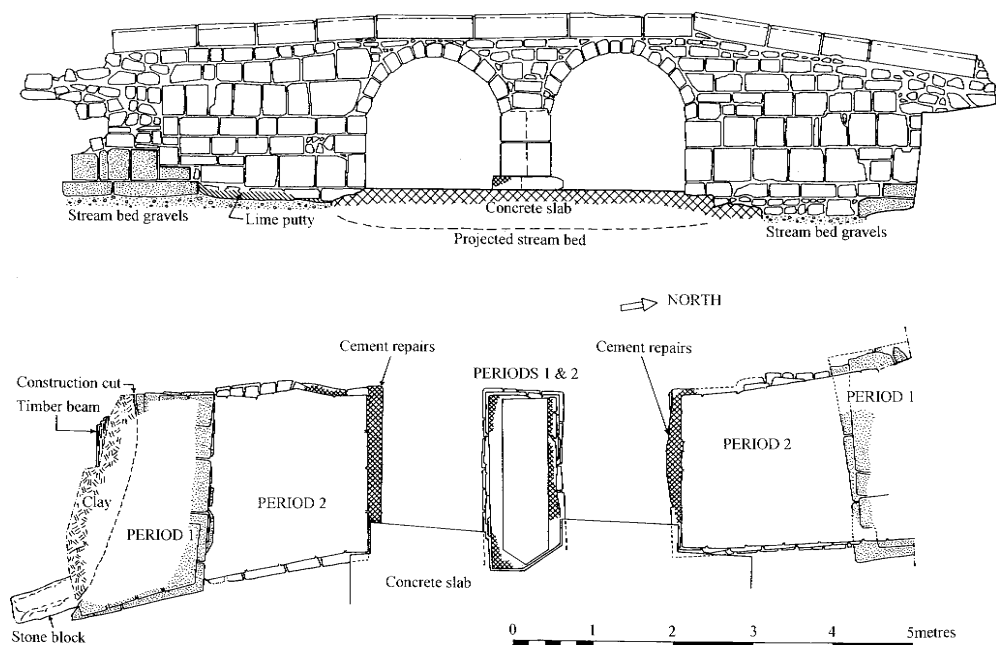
Above: eastern, upstream elevation; below: plan, Period 1 masonry stippled
